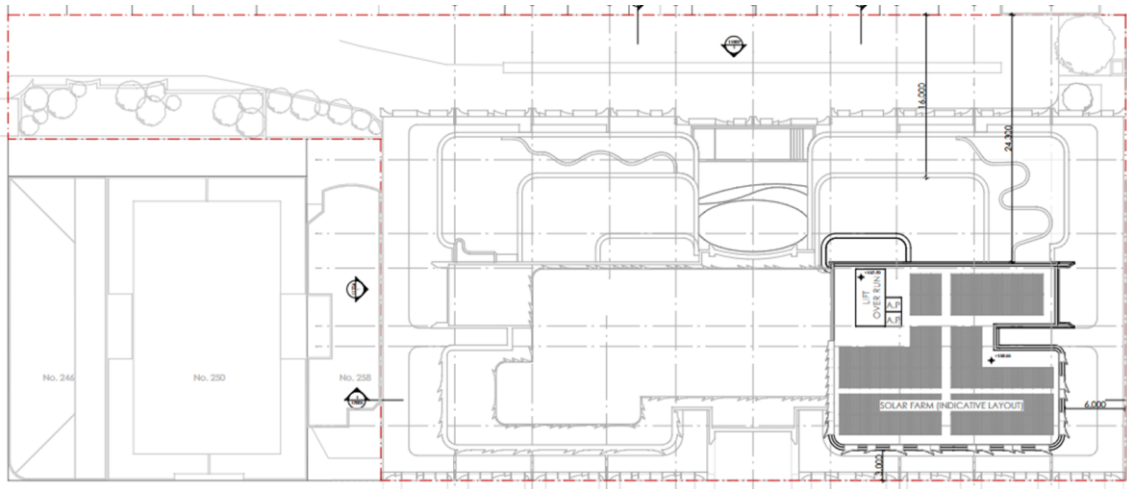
Roof Plan (Source: Fitzpatrick Partners)
